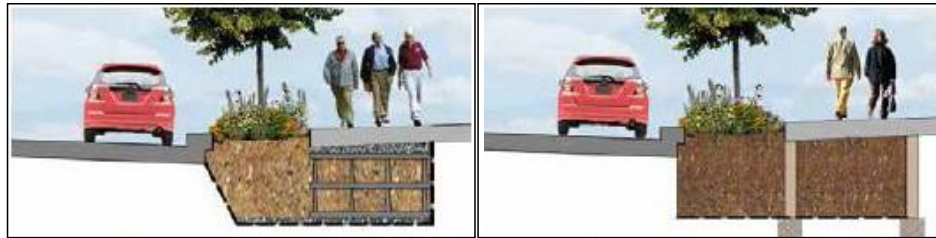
Stormwater tree well filter conceptual examples: modular suspended pavement system (left), column suspended pavement system (right). (Courtesy of Philadelphia Water Department)
